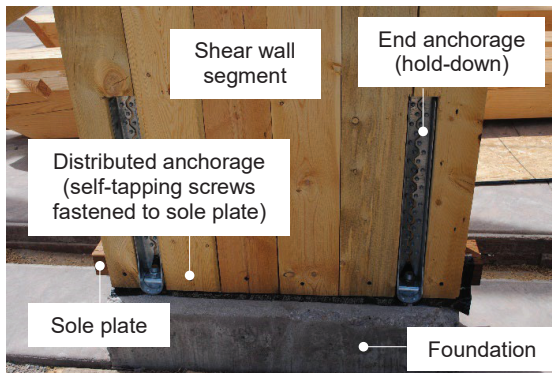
Distributed and end anchorage in an interlocking cross laminated timber shear wall.
